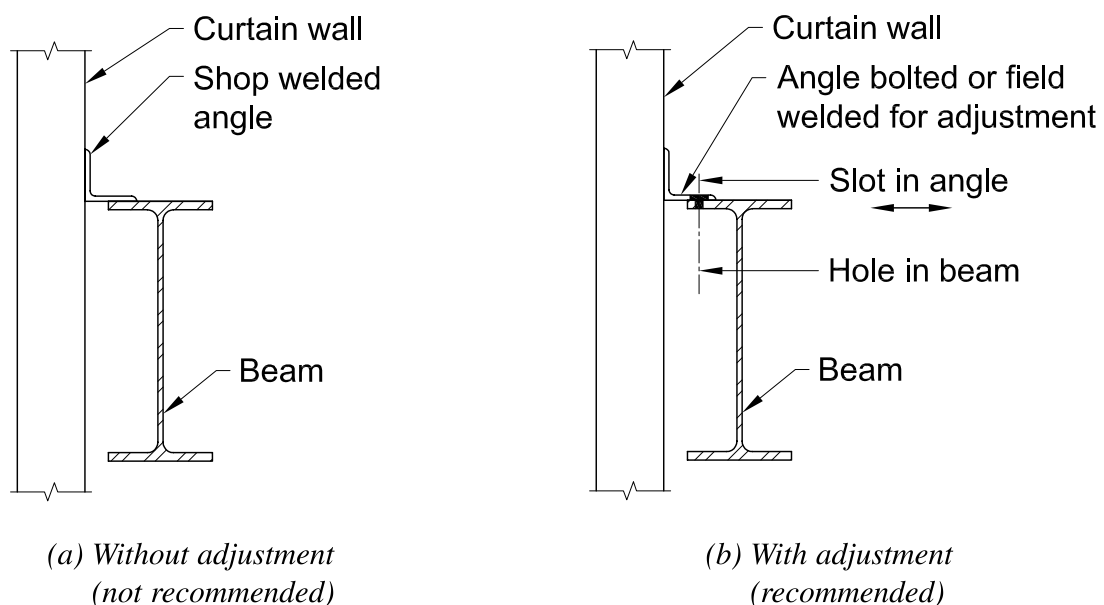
Attaching curtain wall façade systems to structural steel framing.
